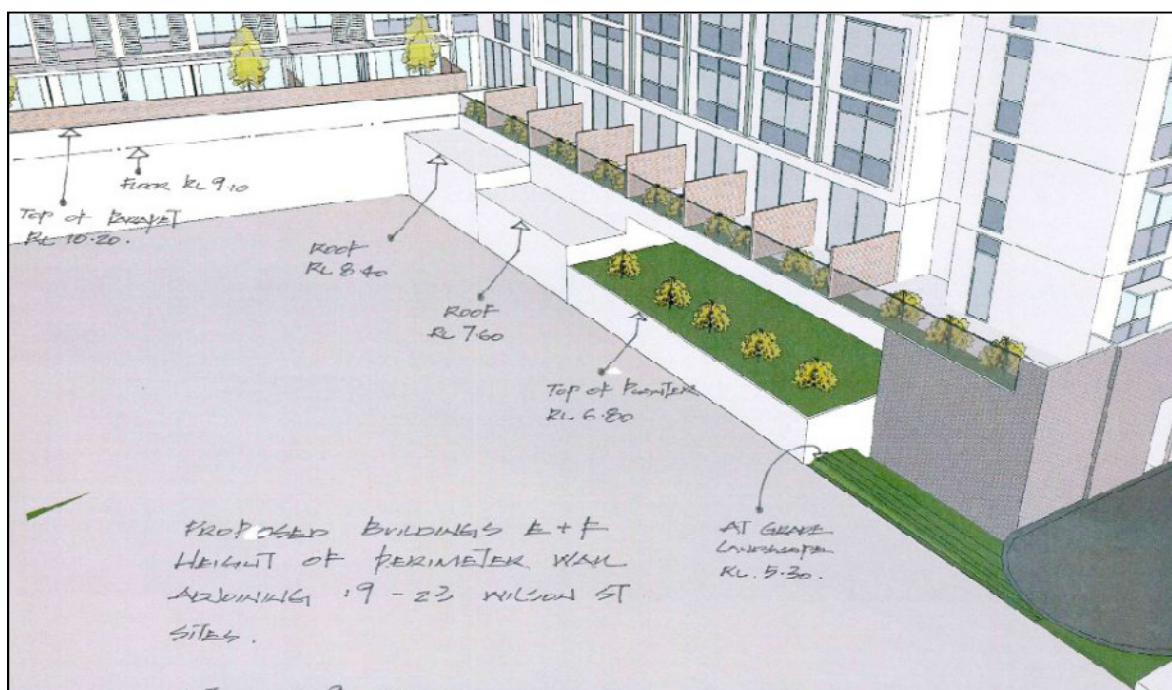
(Extract from applicant's submission above) – The wall heights and RLs of the proposed development in relation to the adjoining site at No. 19-23 Wilson Street.
